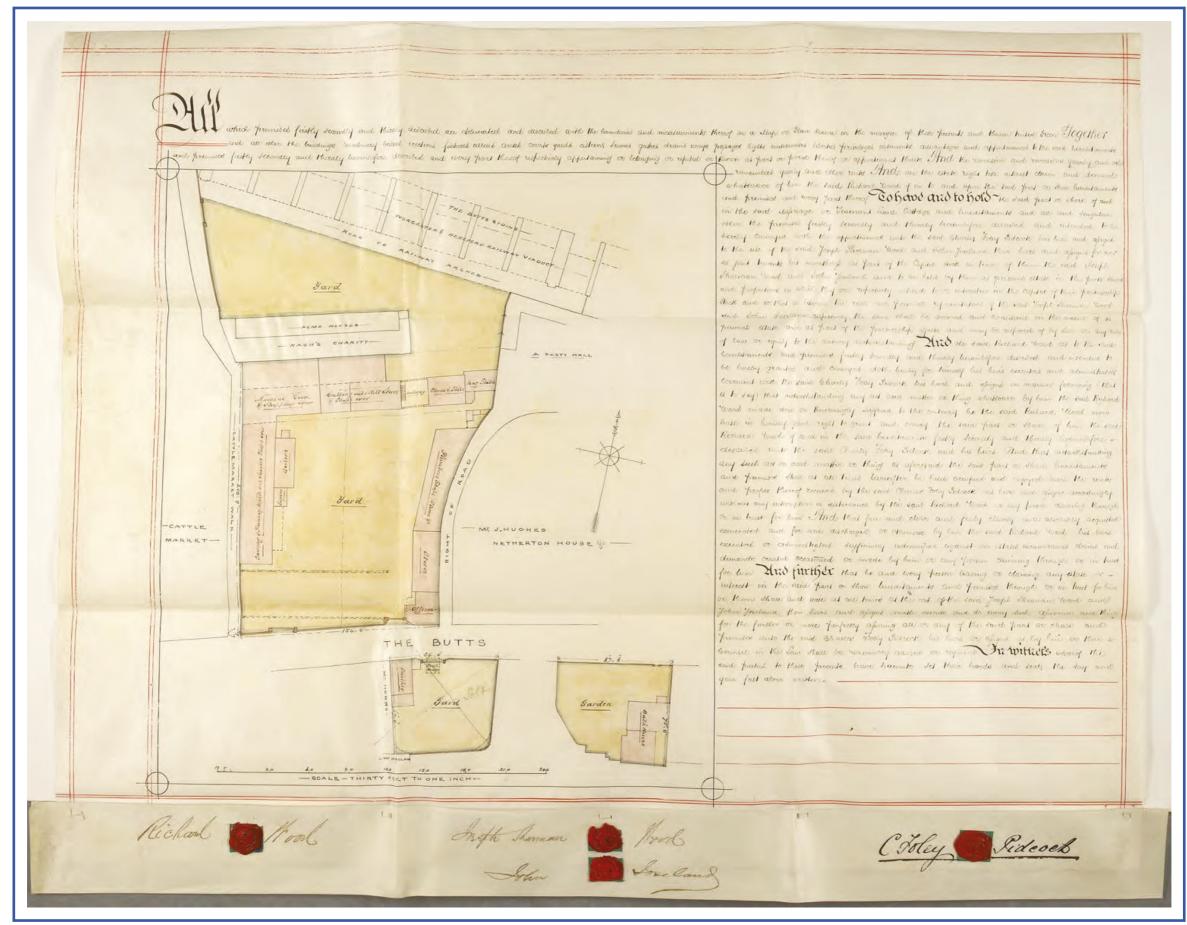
Worcester City planning application (WRO ref b496.5 BA10827/9)
